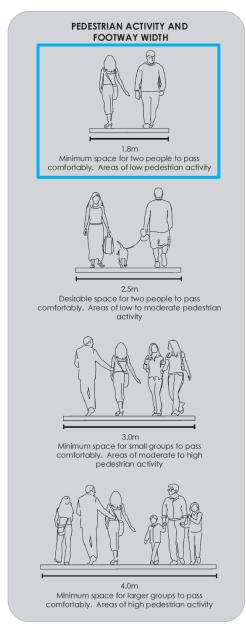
Recommended footpath width (source: Design Manual for Urban Roads and Streets)
